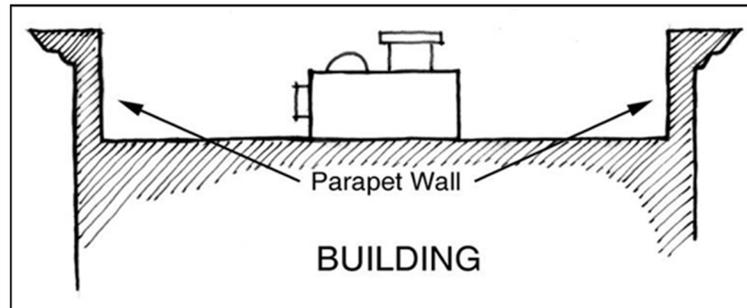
Example of how parapet walls are utilized to screen roof mounted mechanical equipment.
